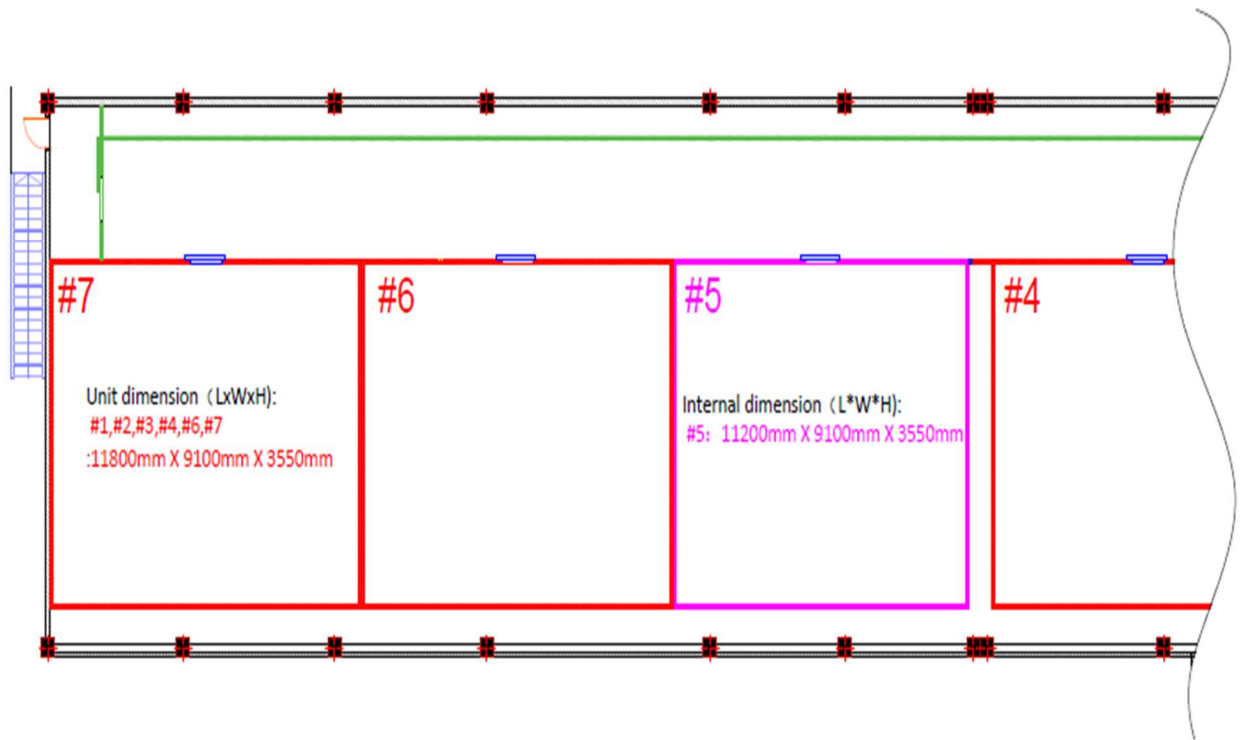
Structural Layout and Dimensions of the Cold-rooms
